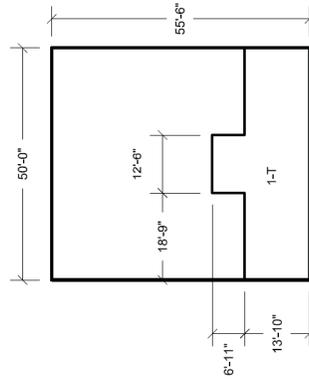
H-6-122A: COOLING TOWER INTERNAL WALL LOOKING WEST
